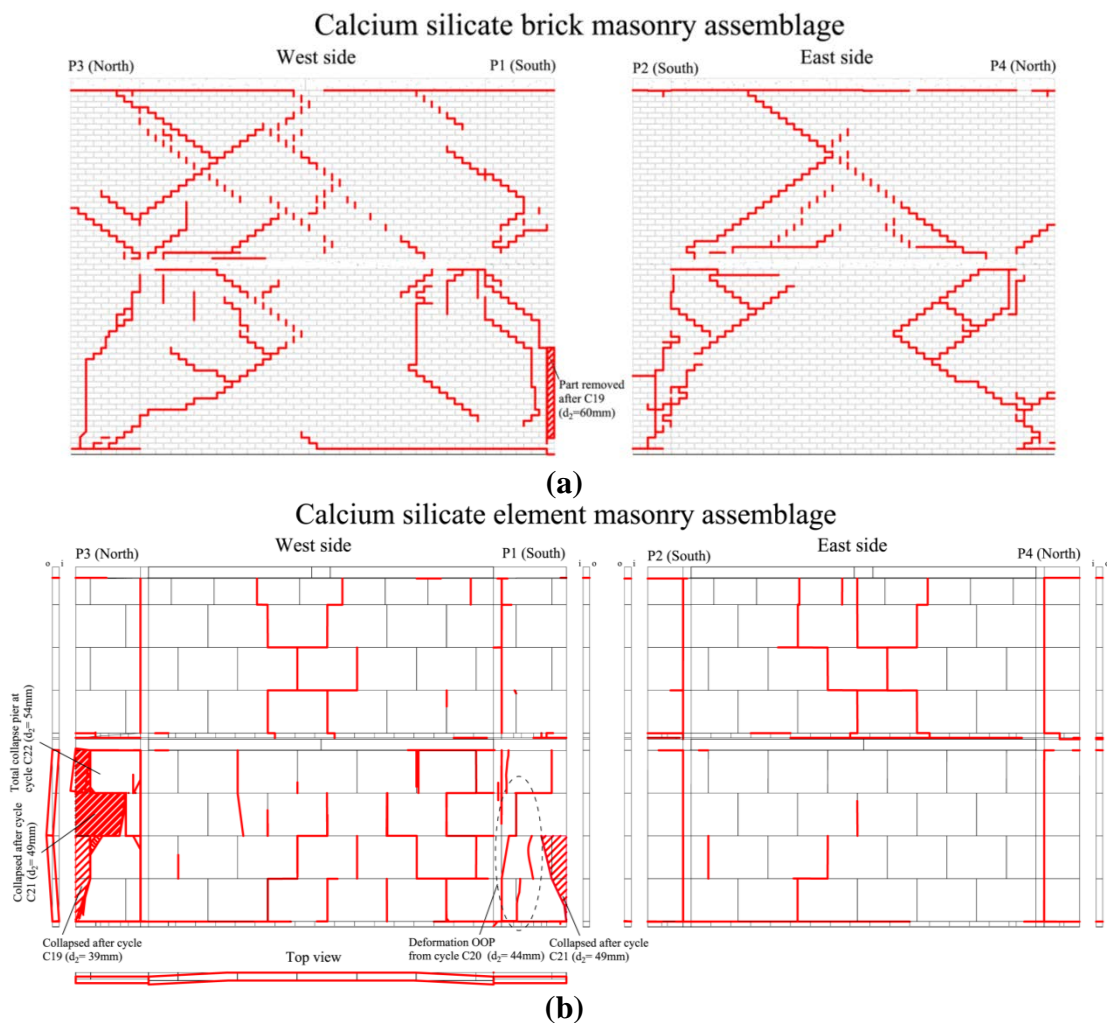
Crack pattern: (a) CS brick masonry; (b) CS element masonry.
